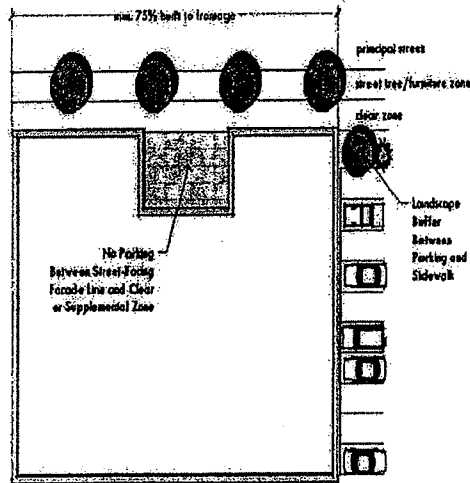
Parking to the side of a building is permitted but screening is required between the parking and the sidewalk. No parking is permitted between the building and the sidewalk on a Core Transit Corridor.
